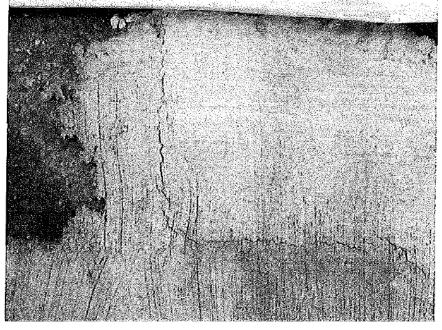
View of cracks in the foundation wall on the west side of the building. Note the previous repair mortar between the CMU blocks.
